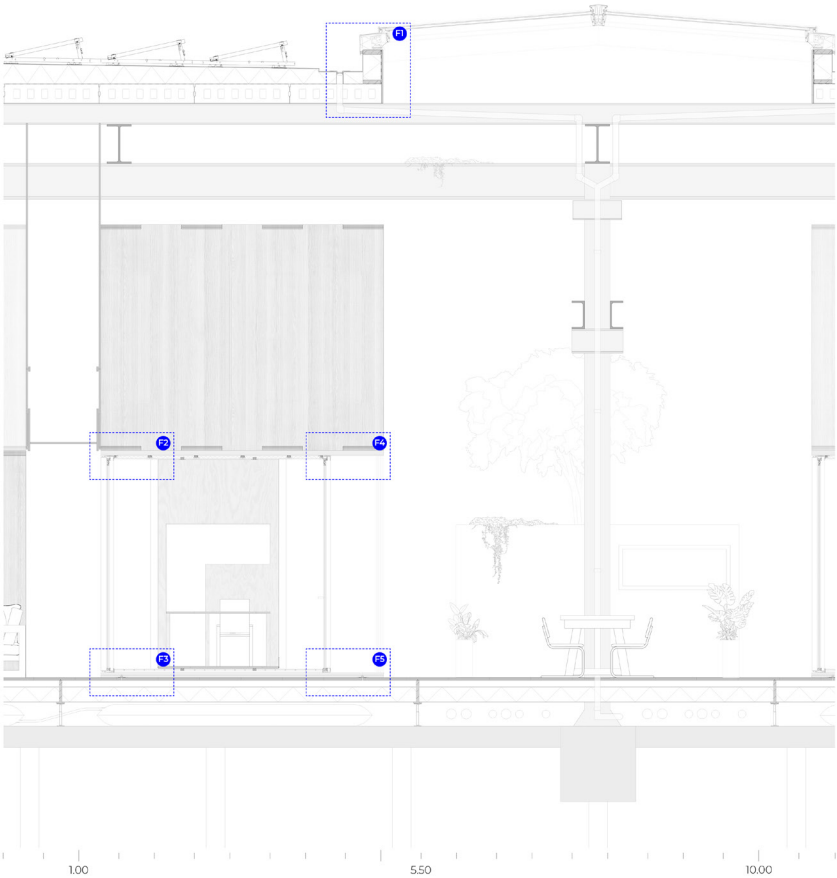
DETAIL DRAWINGS | VERTICAL SECTION E | SCALE 1:10
